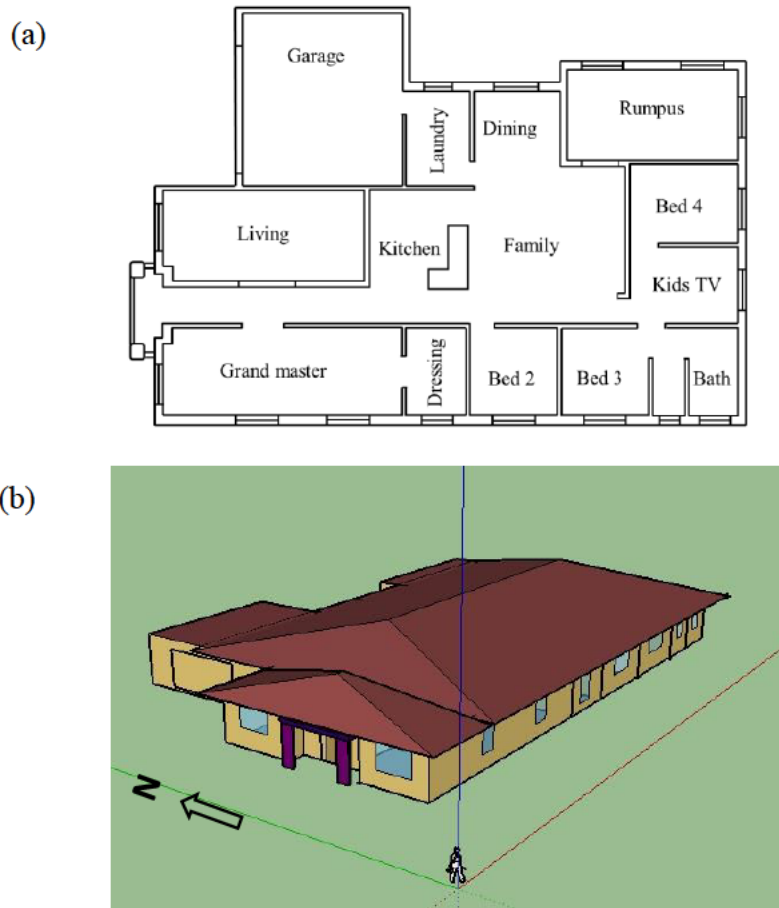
Typical standalone single-storey residential house: (a) floor plan, and (b) 3D view.
